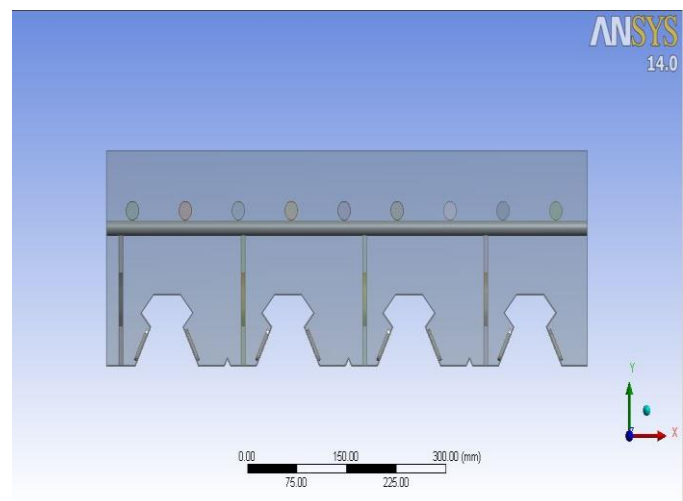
Cross-section of Cofrastra 70 profile sheet
